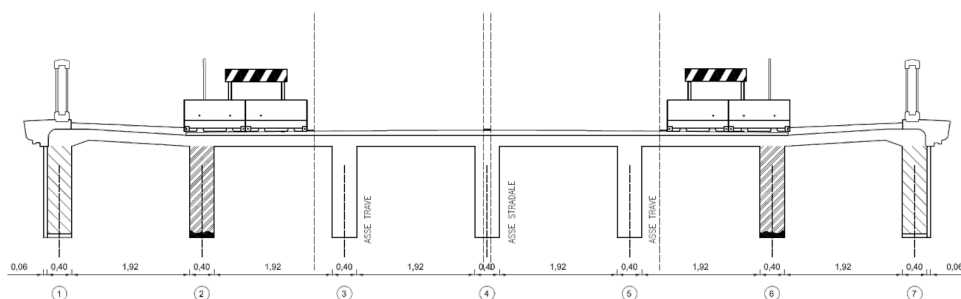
Section of the People's New bridge and the main beams damaged.
